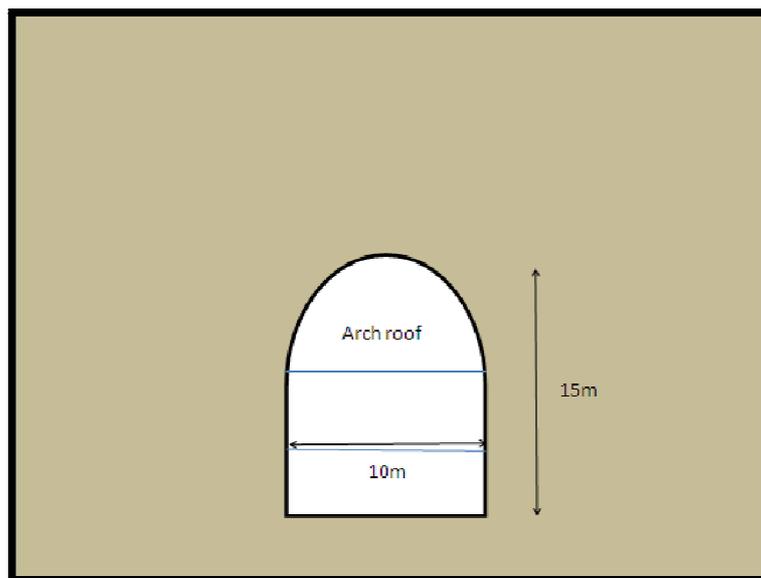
Tunnel Geometry and the Surrounding Rock Mass
